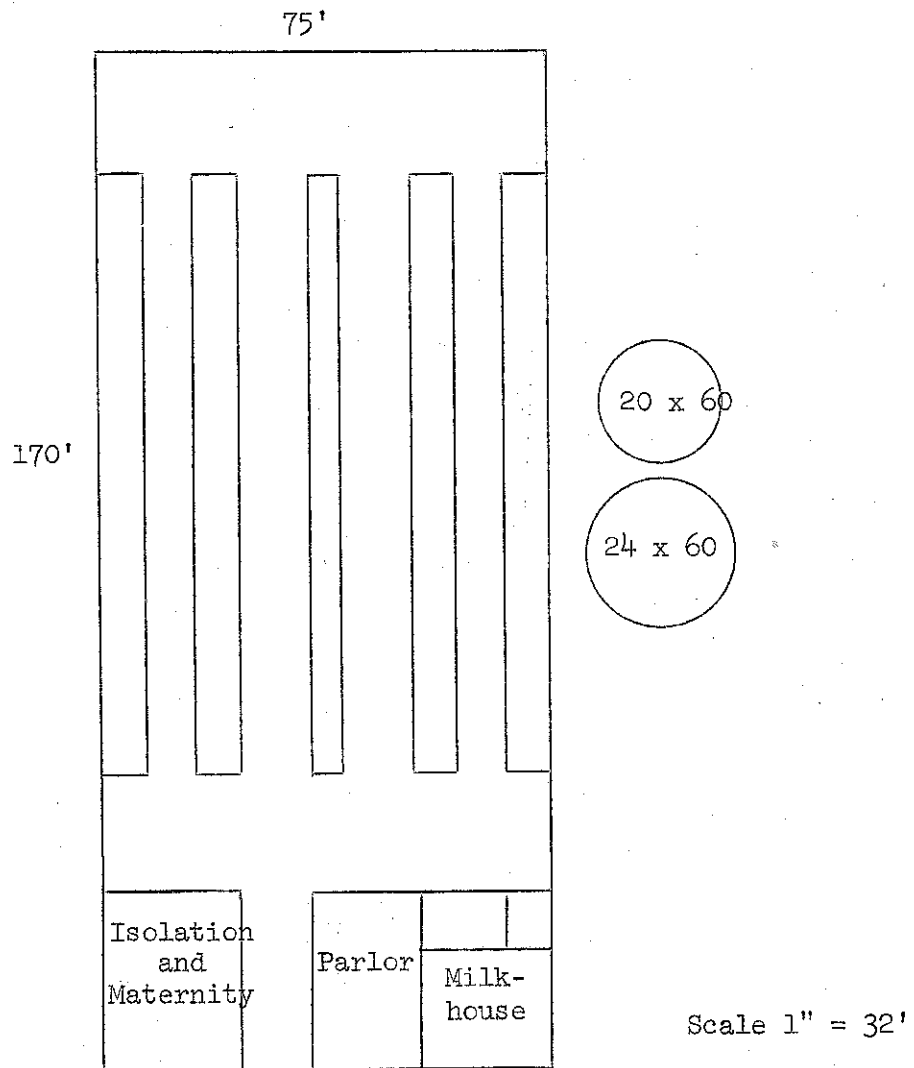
One Possible Floor Plan for a 4-row Free Stall System With 100 Stalls
